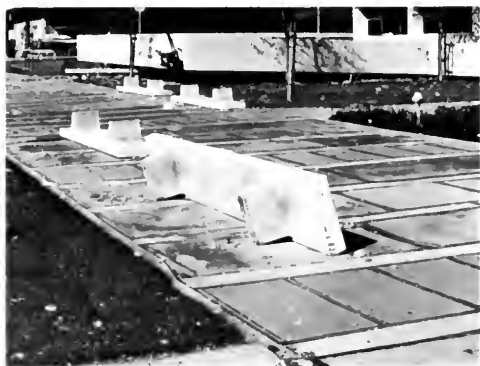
Overturned concrete benches north of the Medical Treatment Building.
